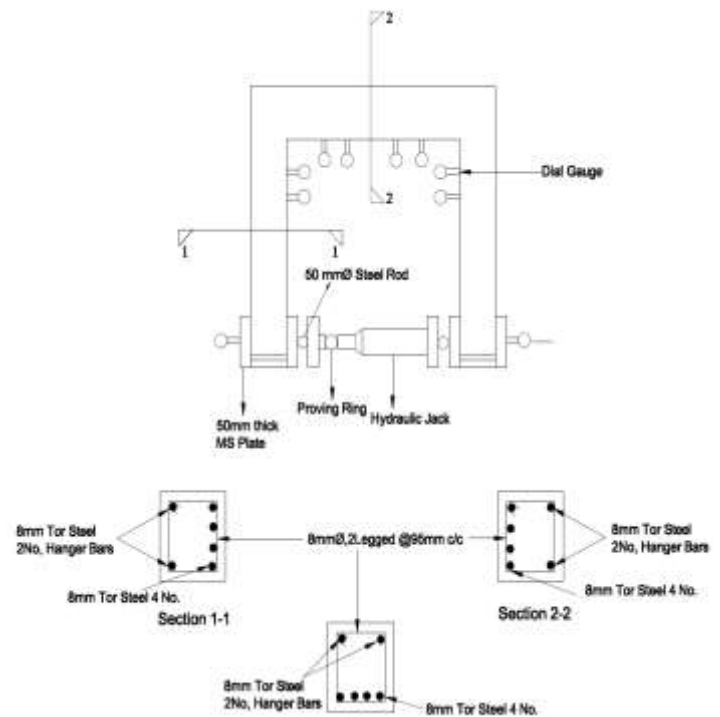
Typical Test Set-up for the Opening Corner Specimen
